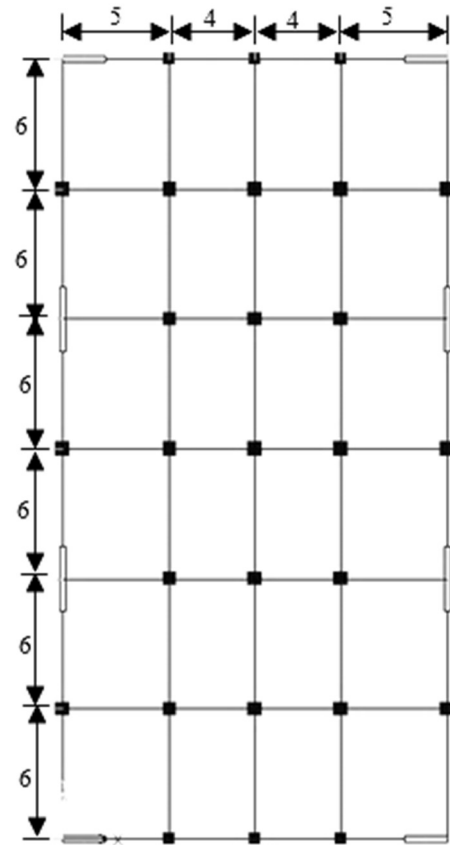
Typical Plan Layout of Wall-Frame Structure
